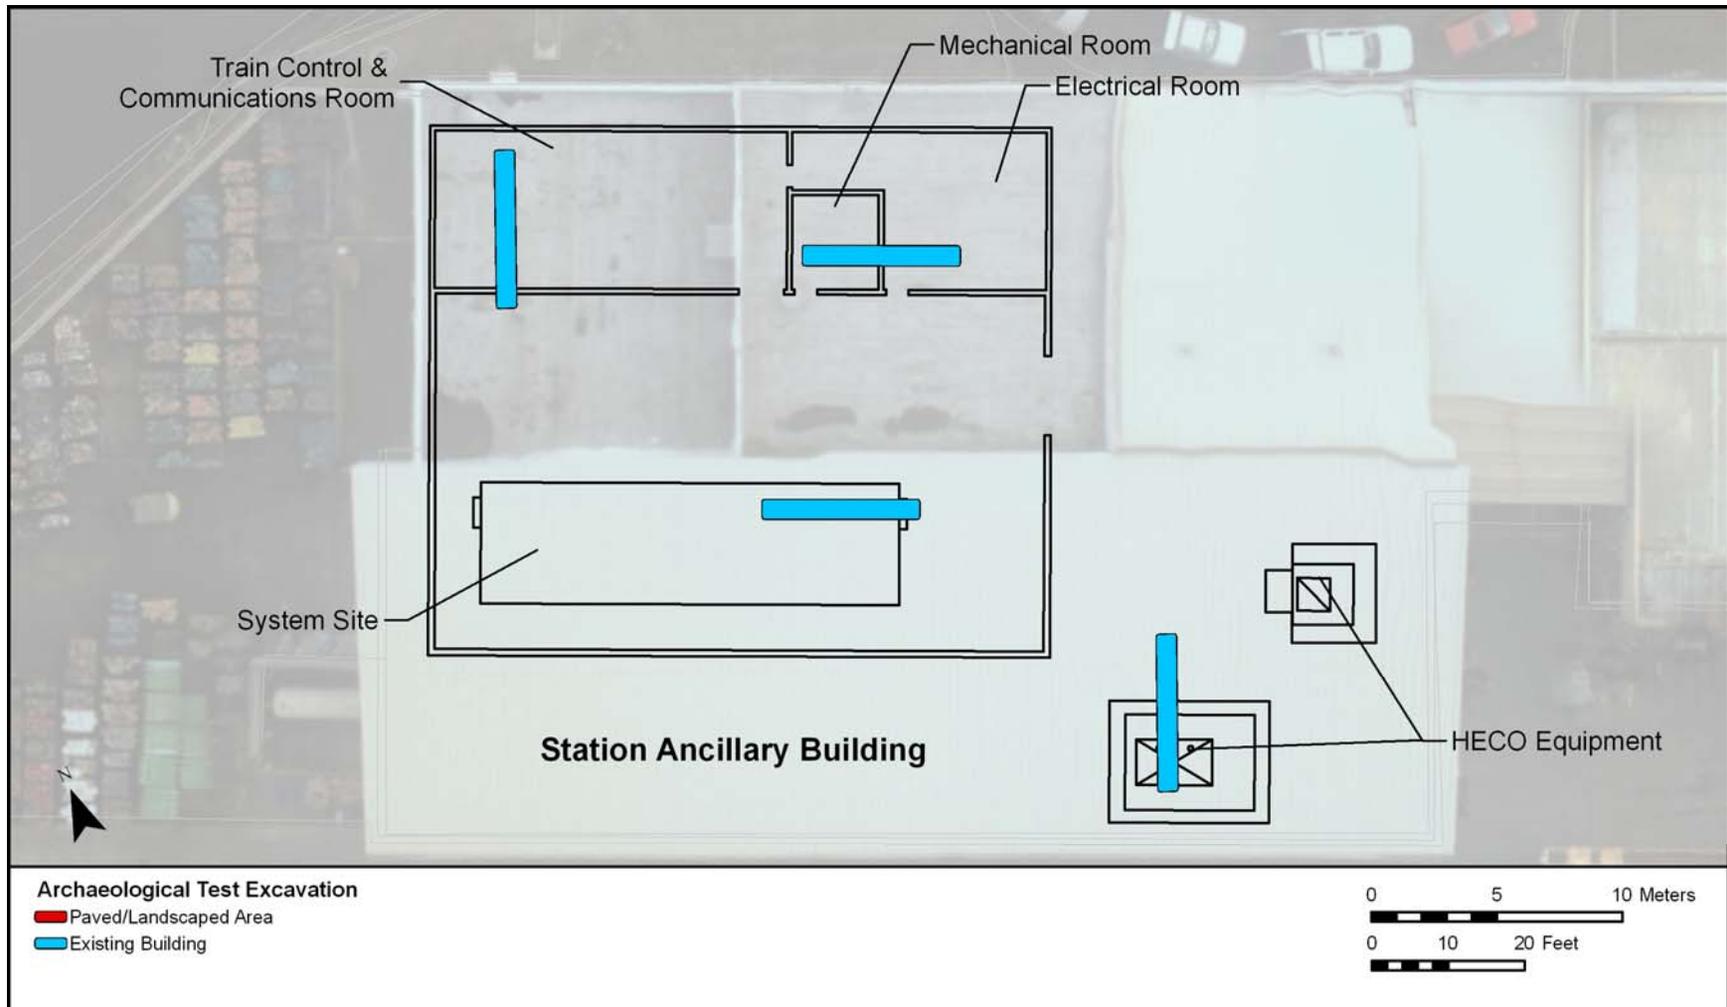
Middle Street Transit Center Station, detail of (*makai*) Station Ancillary Building showing proposed locations for archaeological inventory survey testing (four 2' by 20' test trenches)
